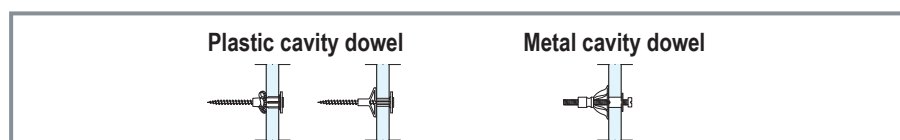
Dowels for fixing bracket loads up to 0.7 kN/m
